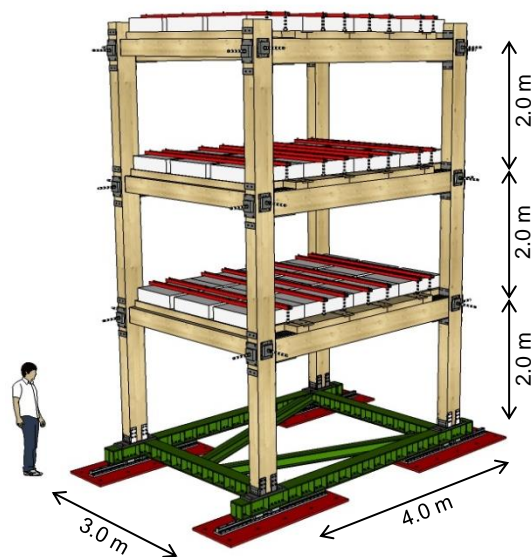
Schematic test setup of the 3 storey post-tensioned glulam frame building (modified from Smith (2014))
